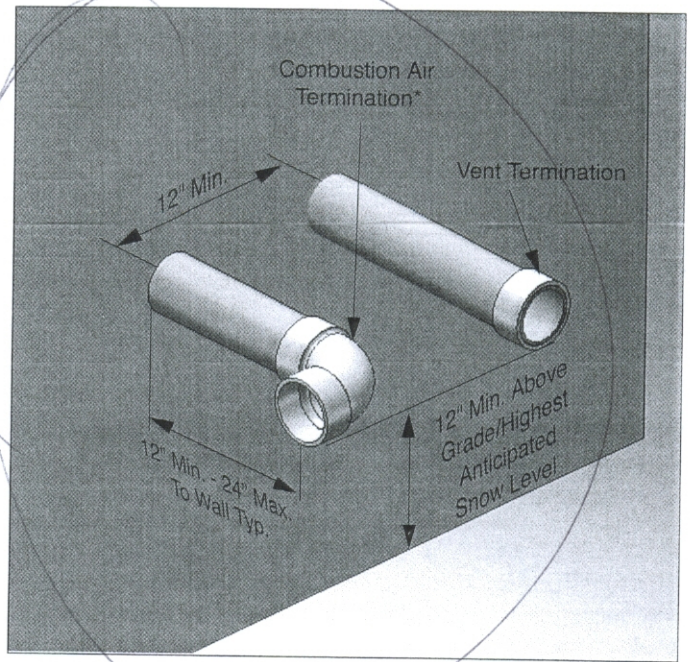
Direct Vent - Sidewall Termination of Vent and Combustion Air Piping with Coupling Vent Termination
